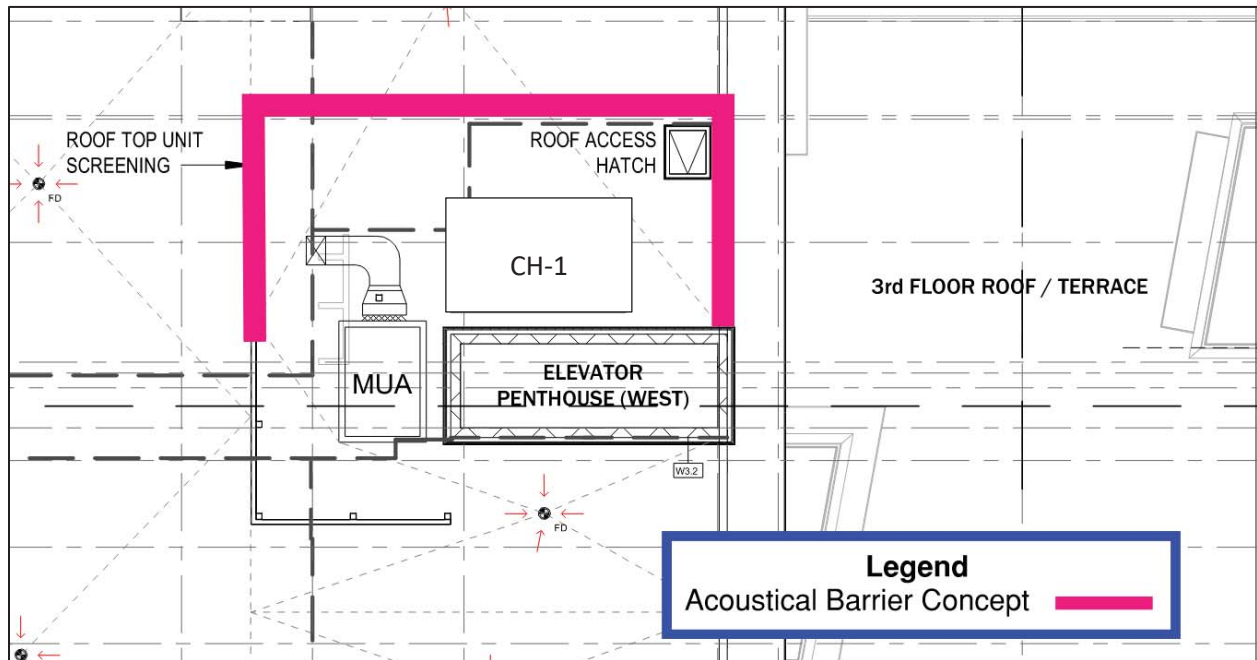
Schematic Showing Acoustical Barrier Concept for West Building Rooftop Chiller Unit CH-1
